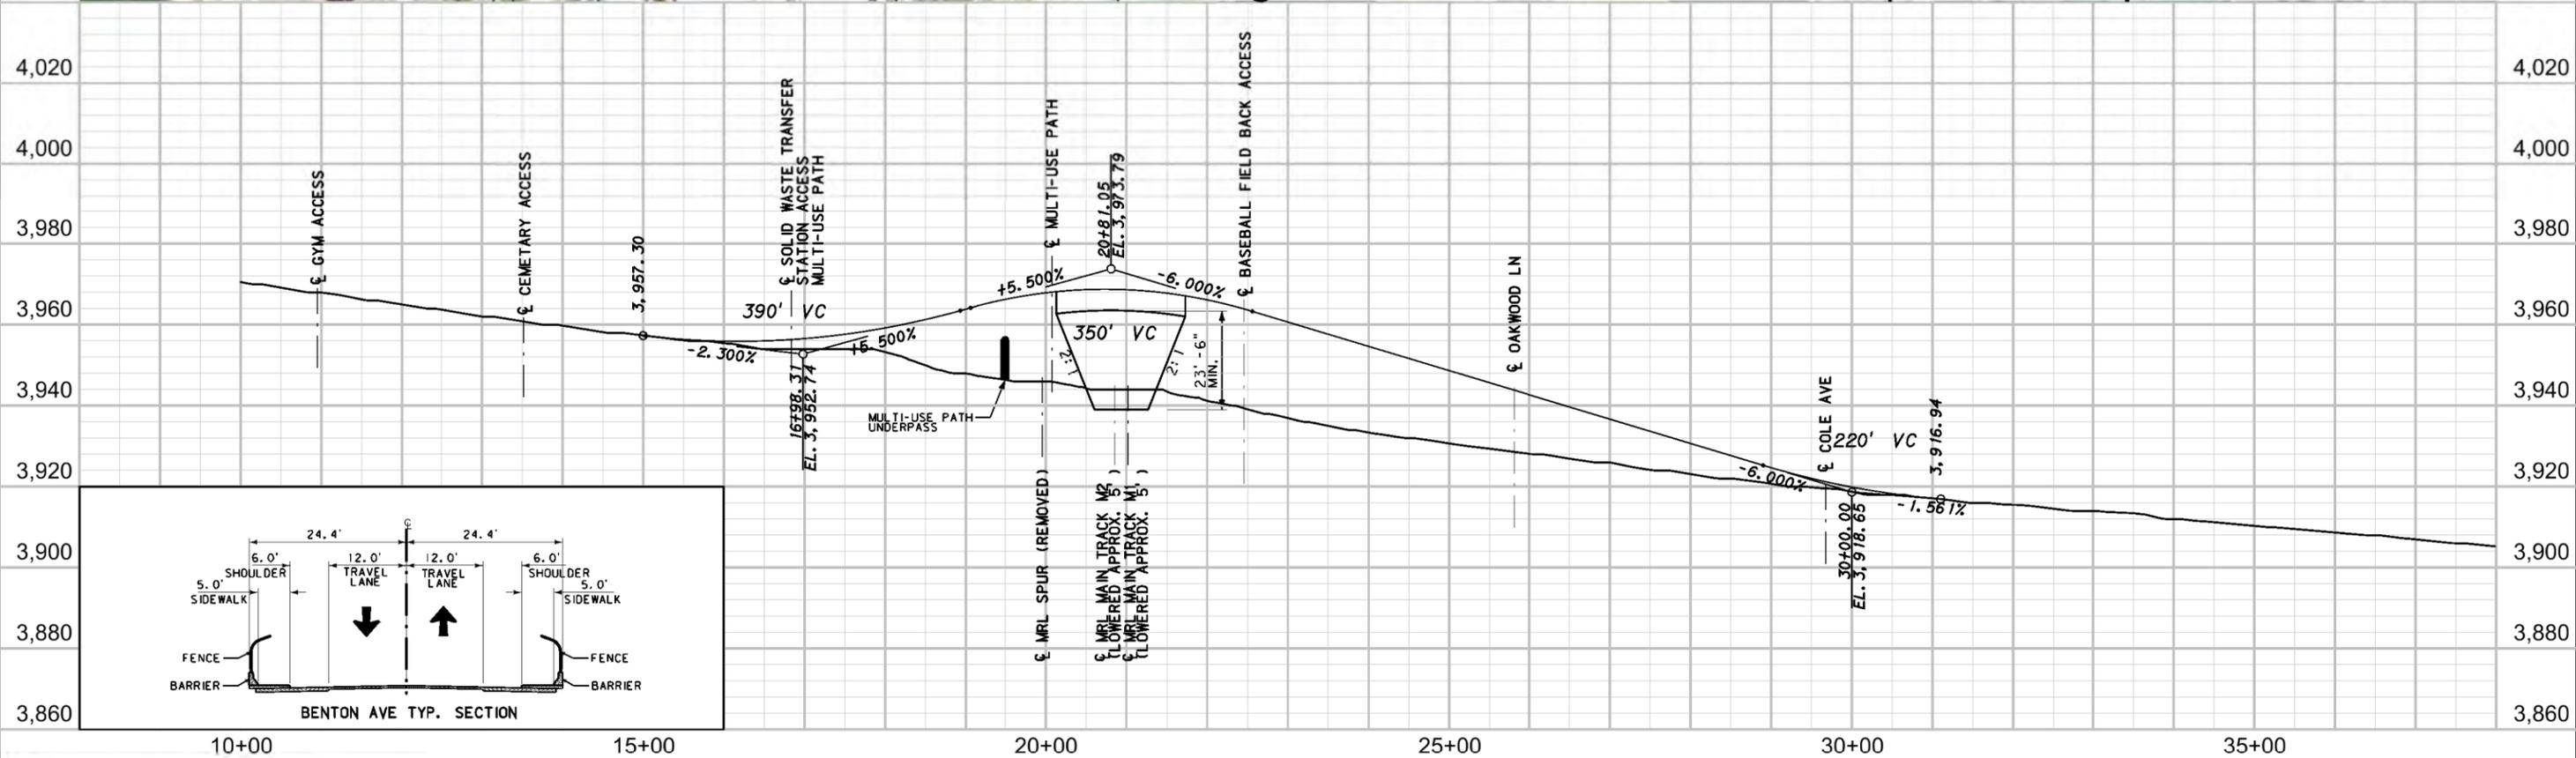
Benton Avenue Overpass Conceptual Plan and Profile
